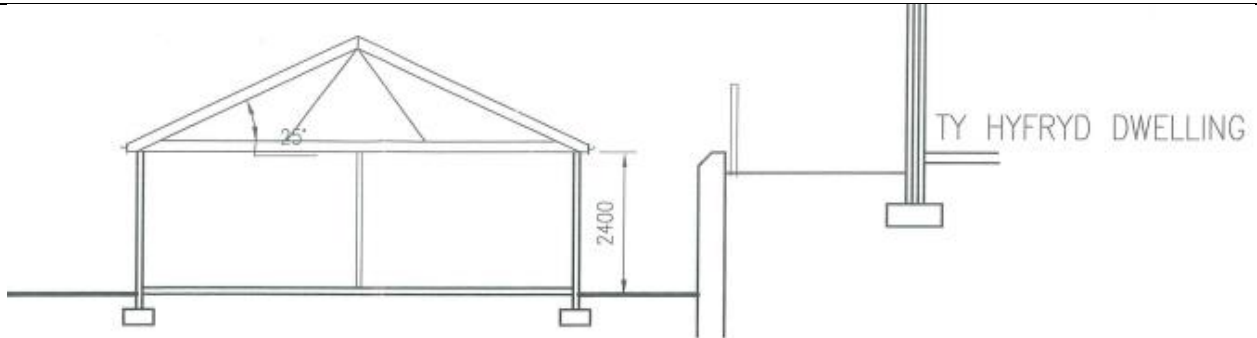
Cross Section Showing relationship of garage to Ty Hyfryd
